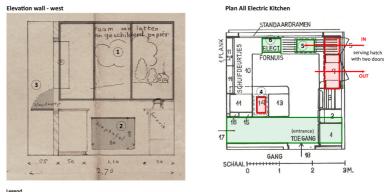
Elevation of the western wall with a trompe l'oeil (left) (Image from Kitchens, 1935); a plan layout comparison between the All Electric Kitchen and Figure 4 (right) (Image by Nieuwe Instituut/LIMP, 35.2, annotations by authors)
